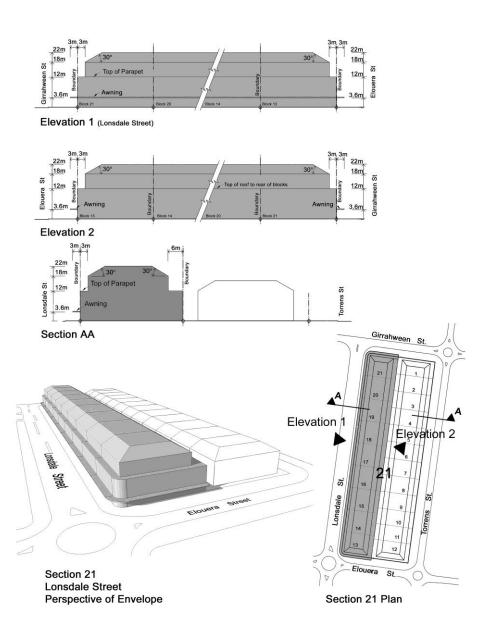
Building Envelope Diagram - Braddon section 21 blocks 13 - 21
